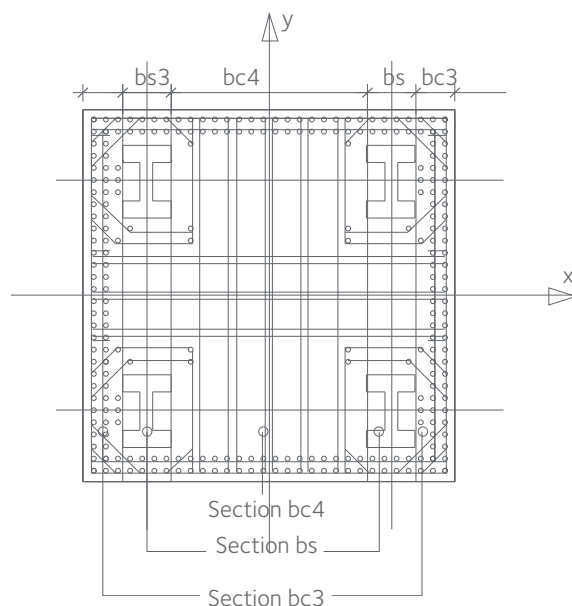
Section layout of reinforcement Example of the Eurocode 4 Design Method
